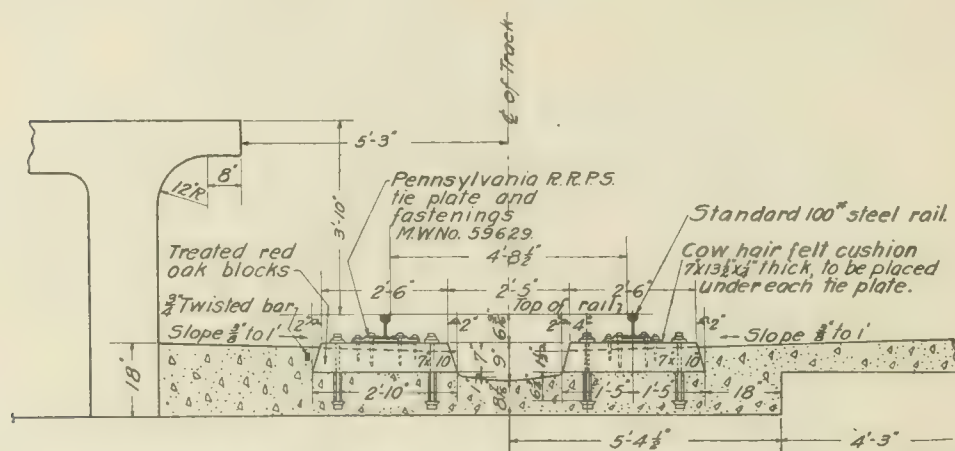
CONCRETE RAILROAD TRACK CONSTRUCTION USED IN PENNSYLVANIA TERMINAL, NEW YORK CITY.
